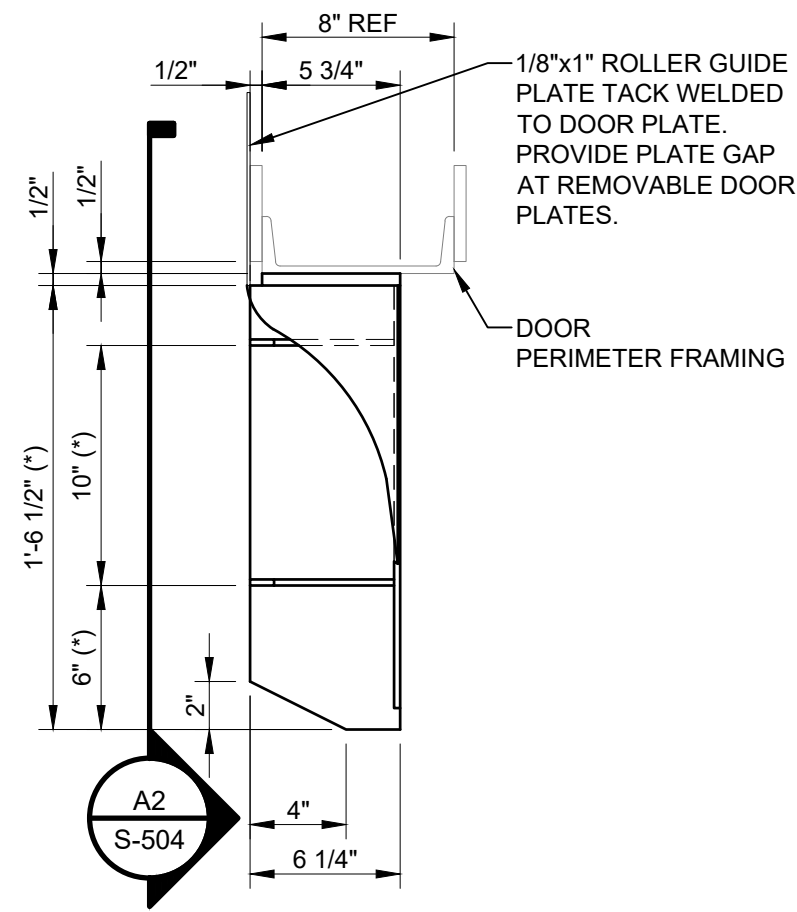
DETAIL - DOOR ALTERNATIVE DRIVE ARRANGEMENT
